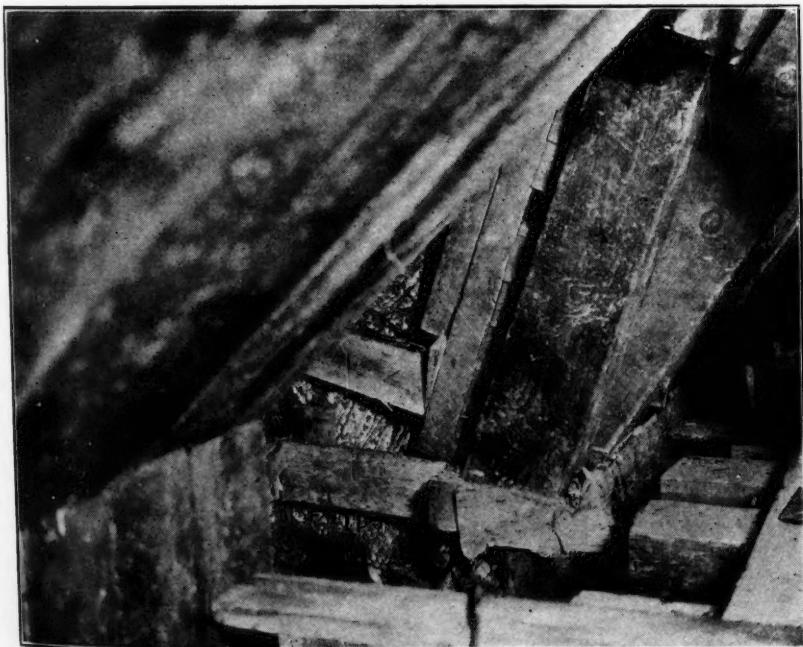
VIEW OF 12 BY 12-INCH WALL-PLATE FAILURE, MOFFAT TUNNEL, WEST PORTAL.
